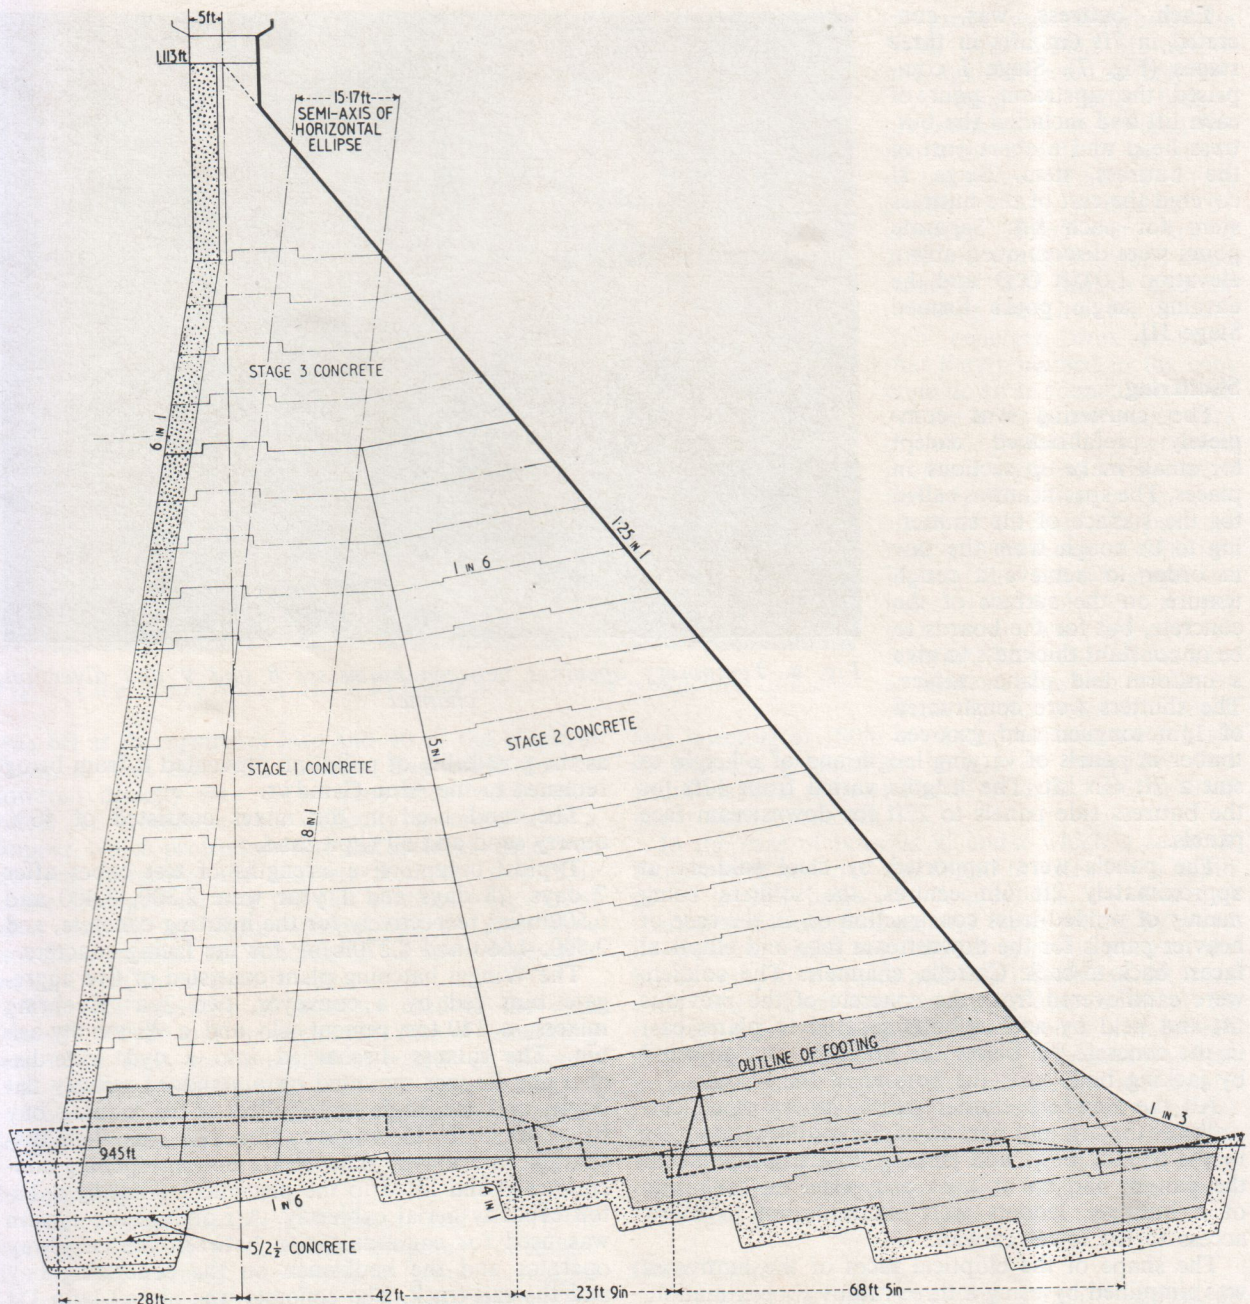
Section of typical buttress at Nant-y-Moch showing concreting details
